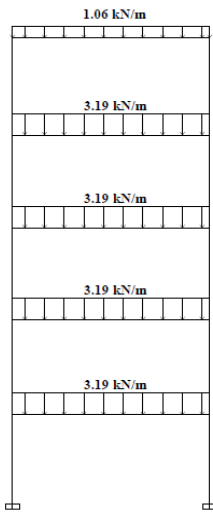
Assigned wall loads for Autoclaved Aerated Concrete (AAC) blocks
